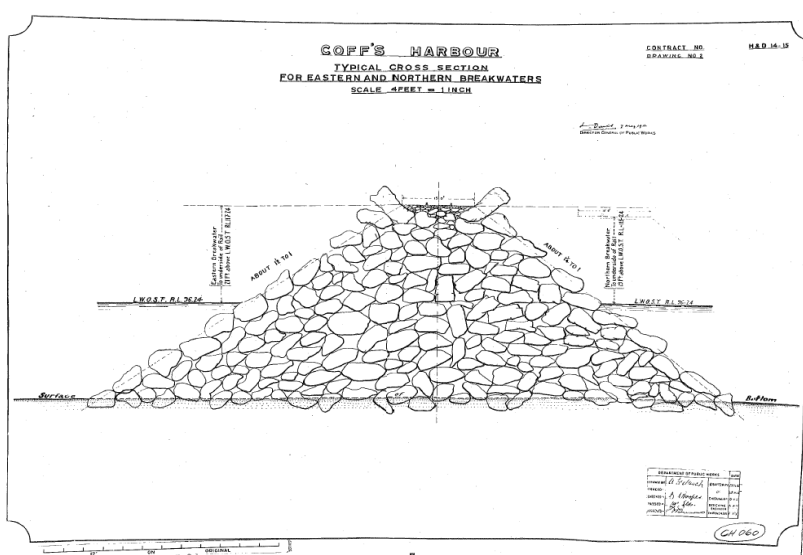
NSW Public Works Department plan of typical cross section for northern and eastern breakwaters at Coffs Harbour, 1912.⁶²
